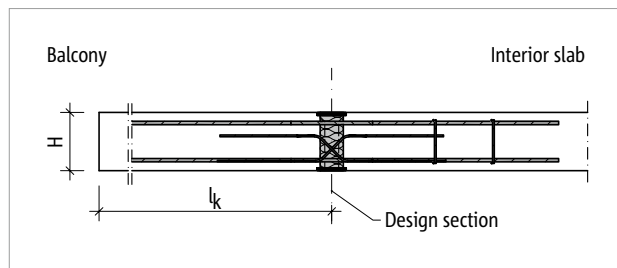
Schöck Isokorb® T Type CD: Structural system
